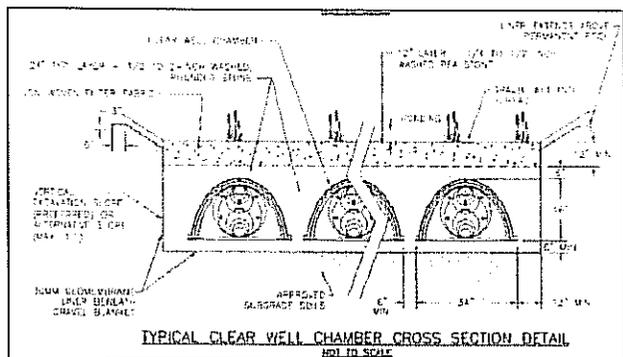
Typical cross section of gravel wetland showing underground storage chambers and vegetated surface where water pushed up from below is designed to pond.
